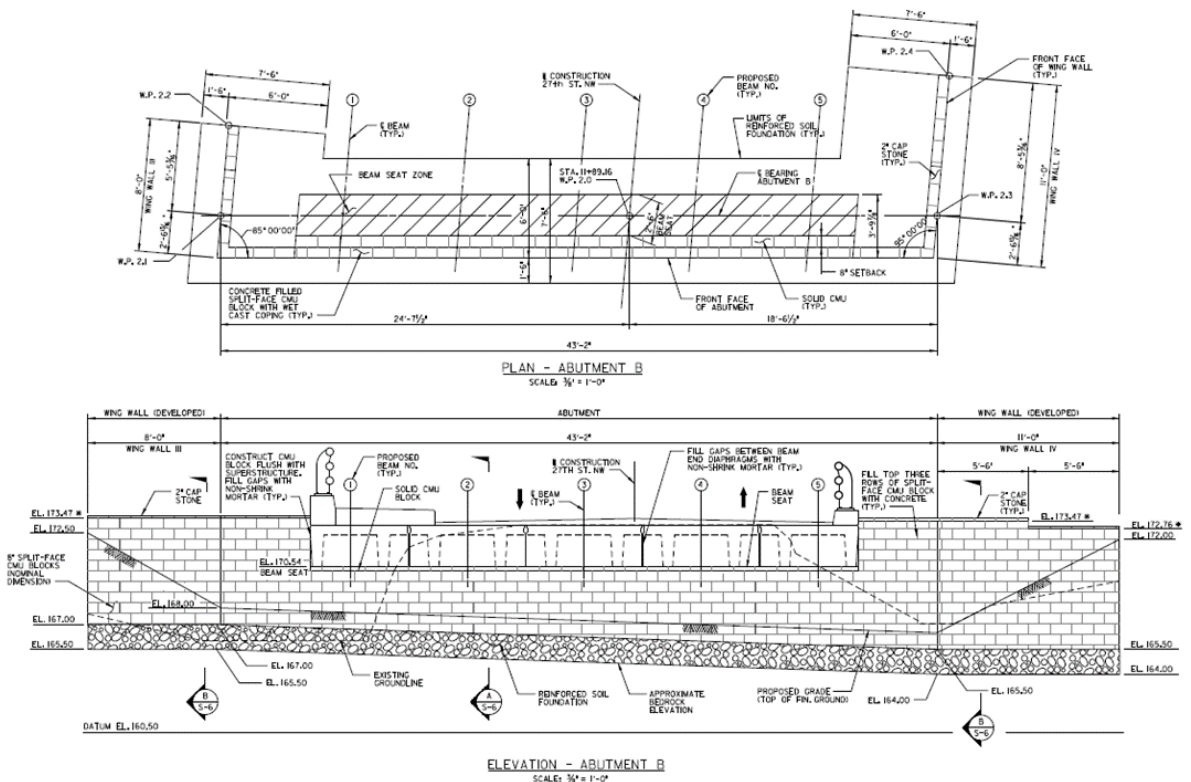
Diagram. Plan and elevation views of GRS abutment B.
